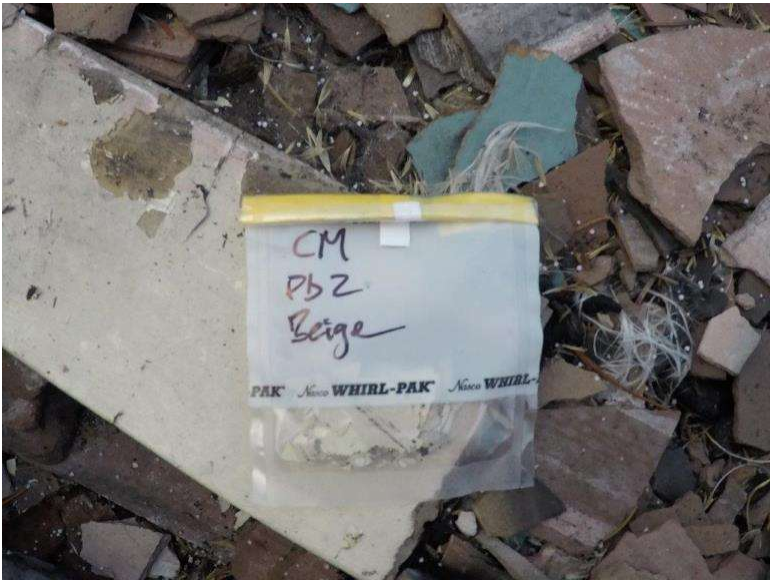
Site 8.2 Coppermine Day Use Area - Red Rock Parkway Asbestos Sample A3, None Detected, Silica Sample S1, 51.01% SiO₂.
